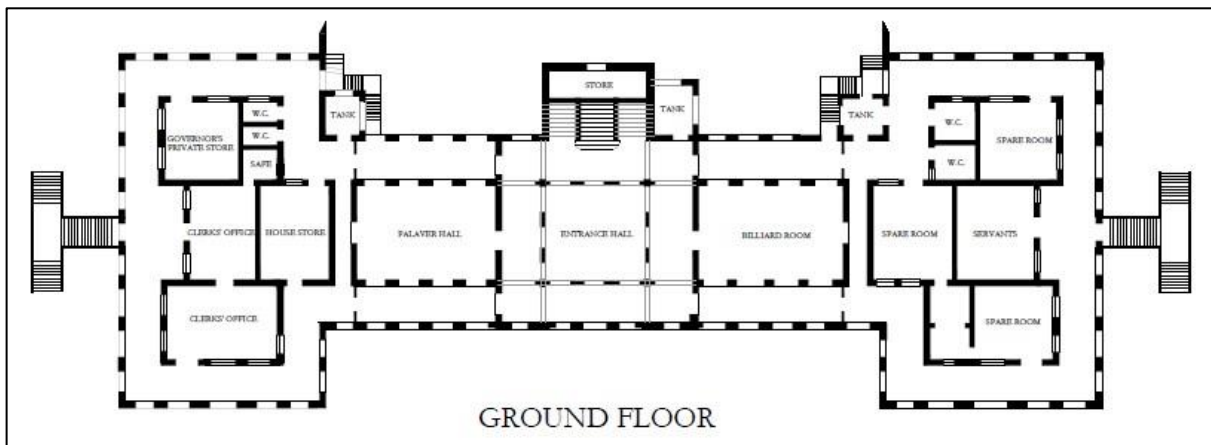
Ground floor plan of Government House as designed in 1889; source: Salami (2016, p.201).
